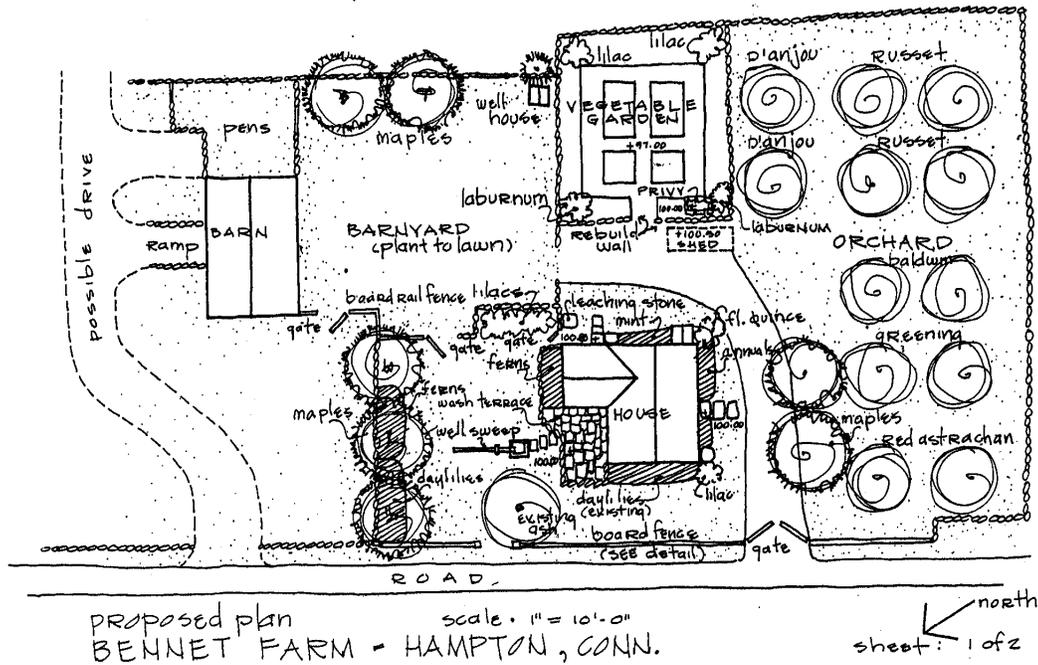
The Bennet Farm, with the dwelling and dooryard in the lower center, garden upper center, barn and yards upper left, and orchard upper right.
